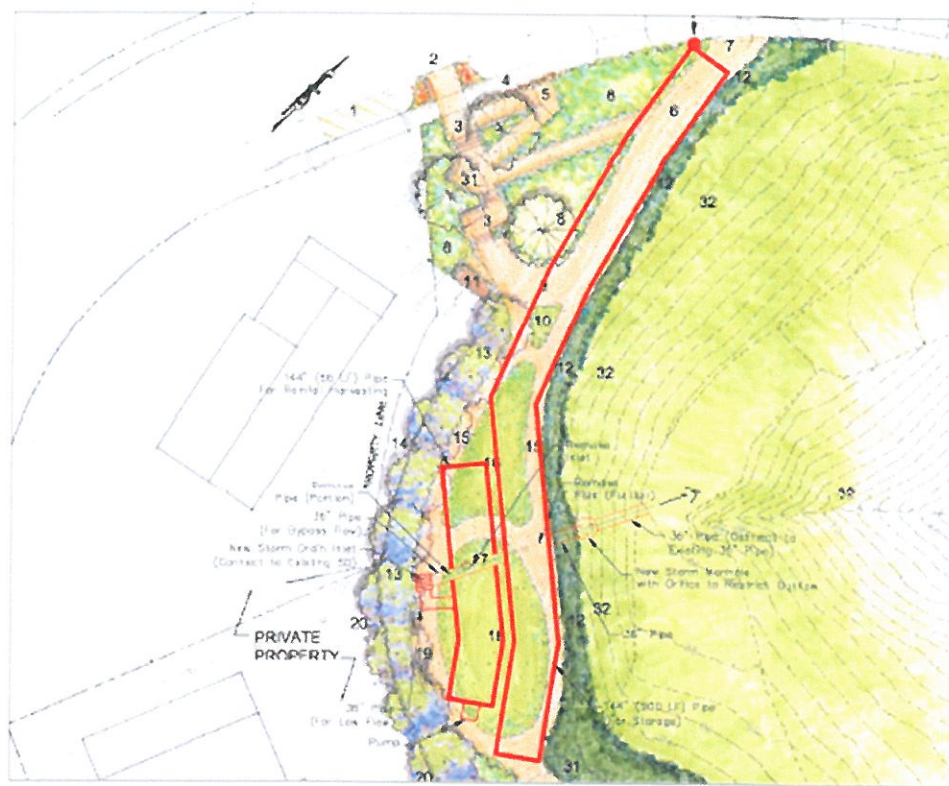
RAINFALL HARVEST SYSTEM CONCEPTUAL PLAN
